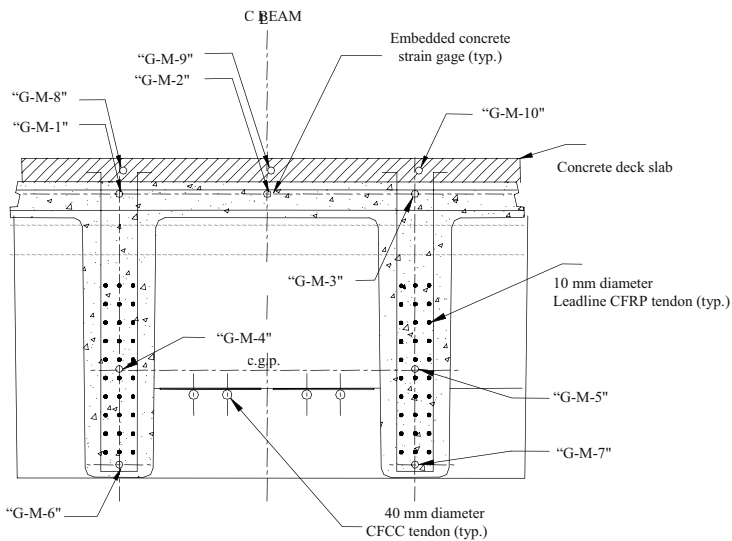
Location of vibrating wire strain gages at midspan cross-section of DT-beam G.
